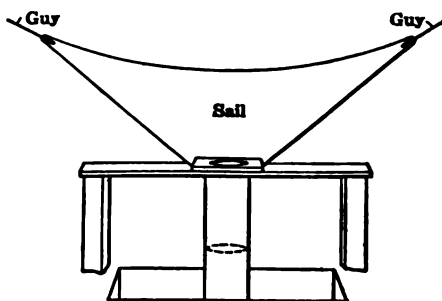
SAIL FOR SHAFT VENTILATING.
